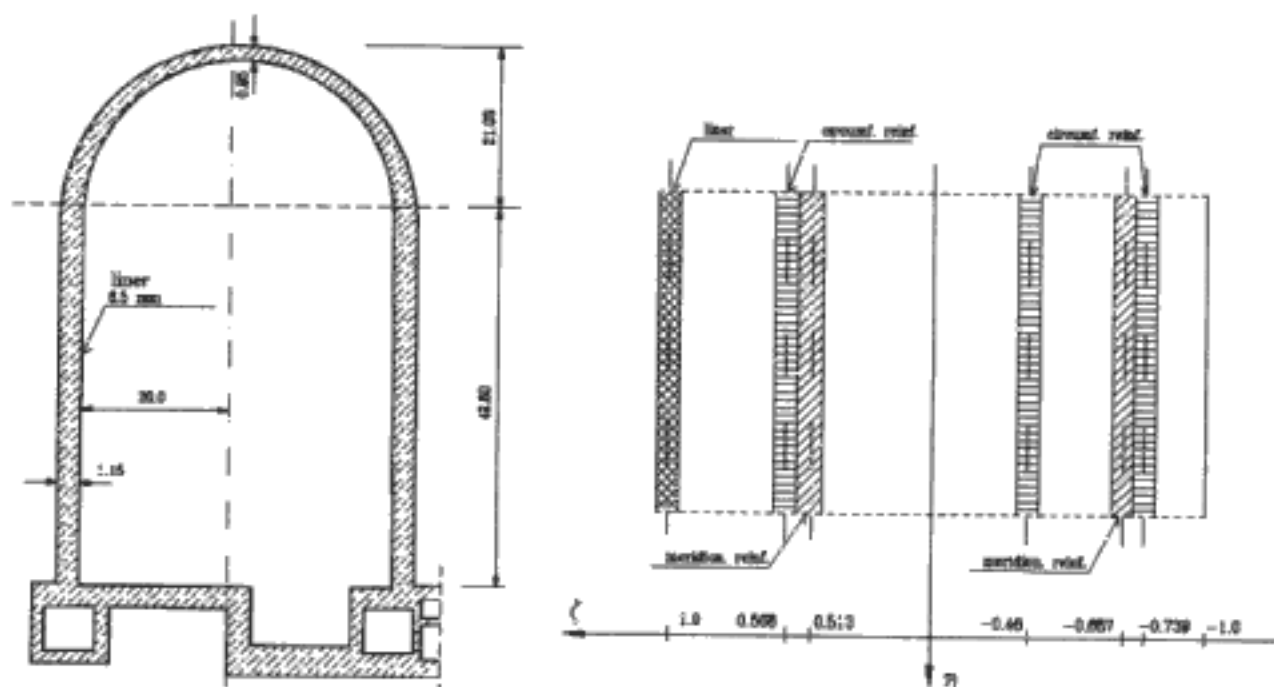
The vertical cross-section of the structure and the typical cross-section of the wall.
